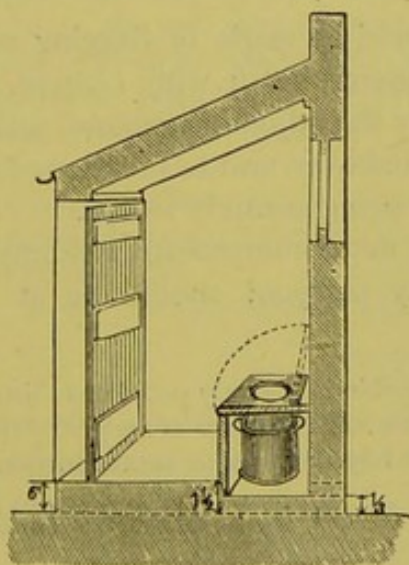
SECTIONAL VIEW OF A PAIL-CLOSET.
